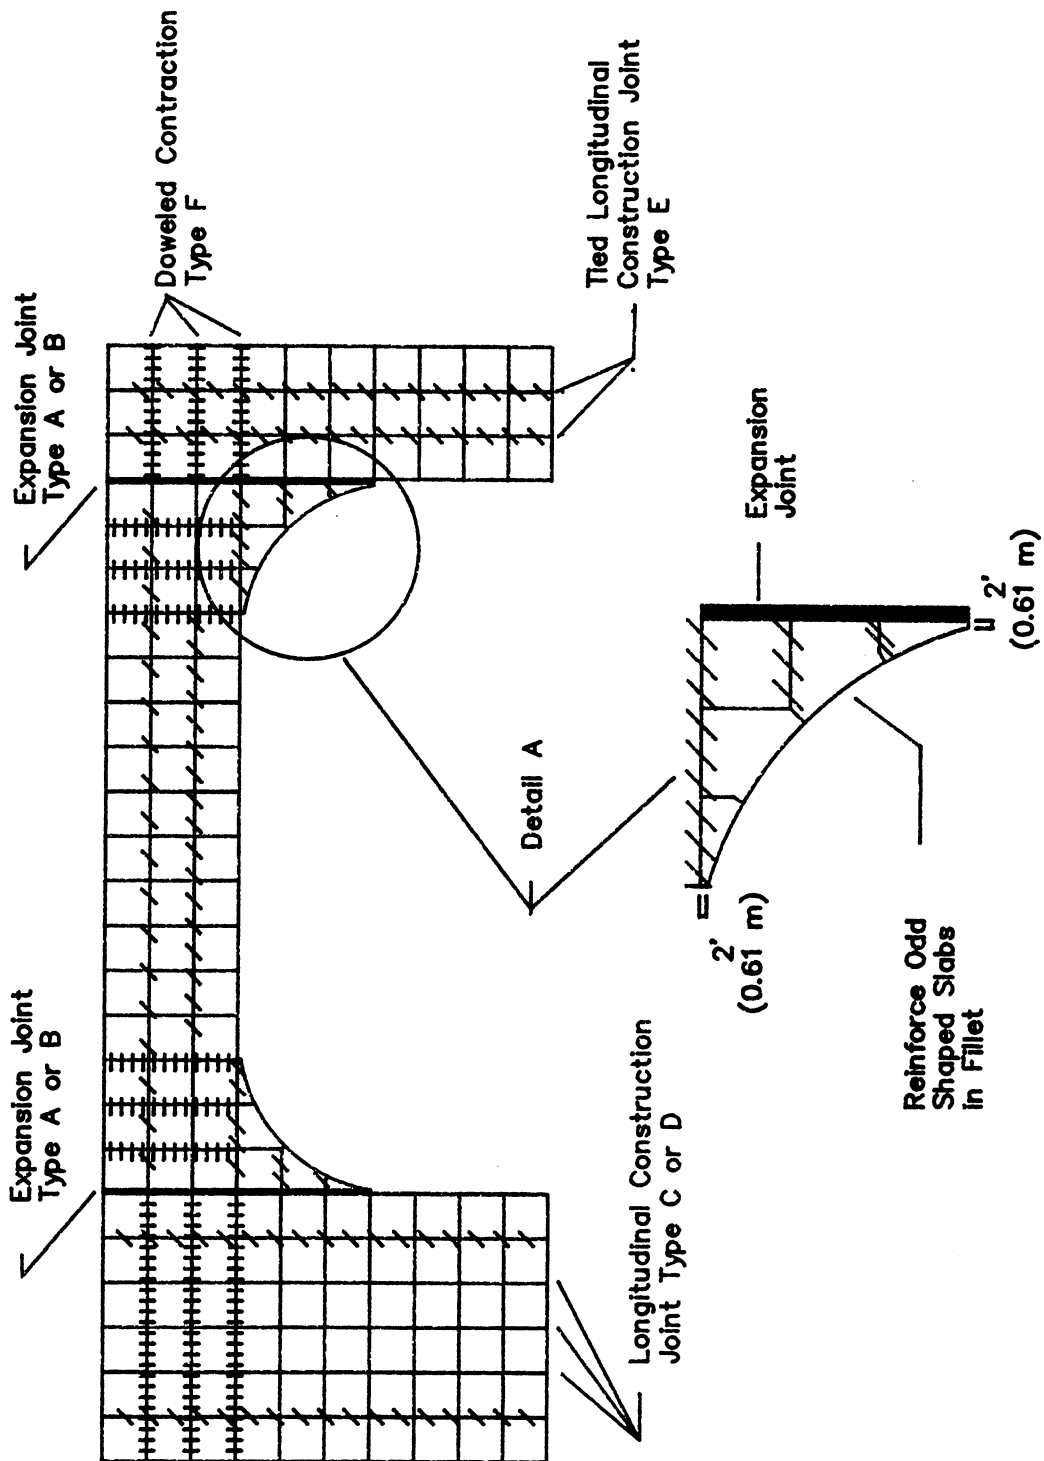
TYPICAL JOINT LAYOUT PATTERN FOR RUNWAY, PARALLEL, TAXIWAY AND CONNECTOR
